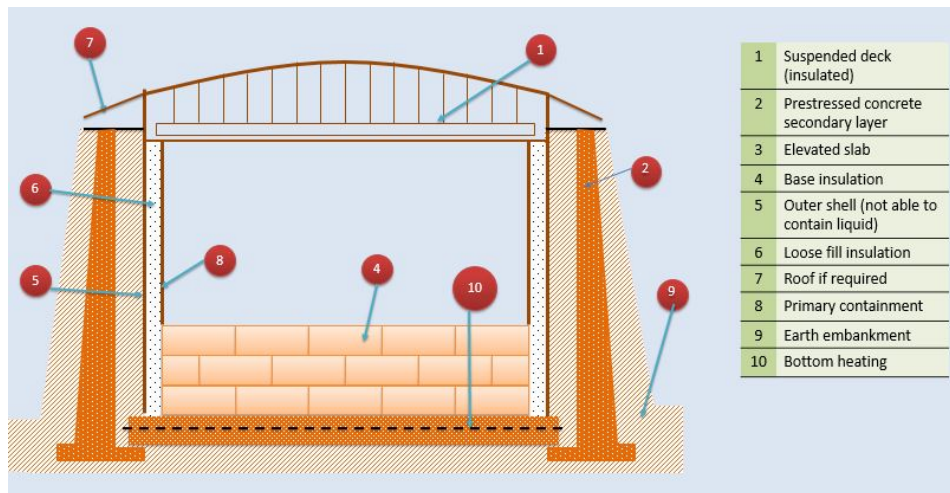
A schematic of a double containment ammonia storage flat bottom design
